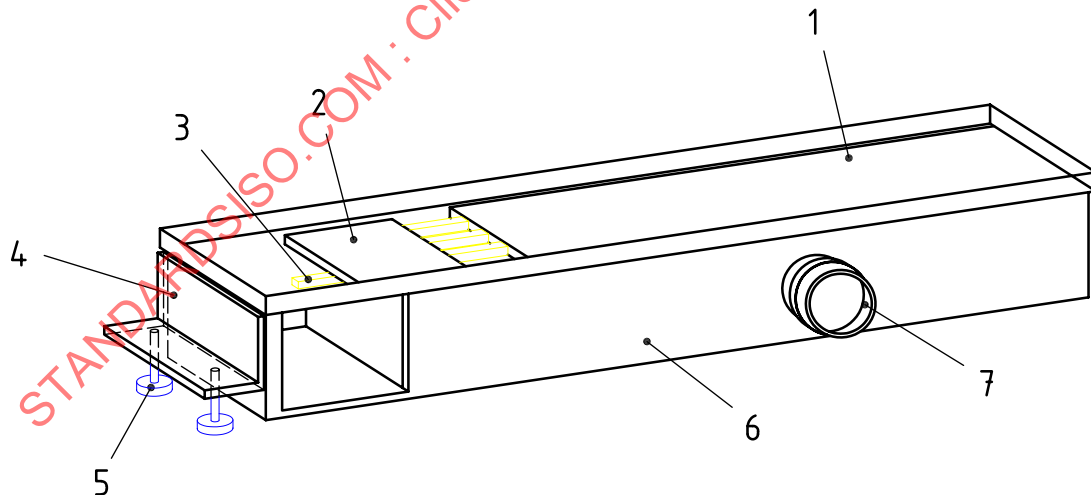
Floor convector with fan (underfloor fan-coil unit)
